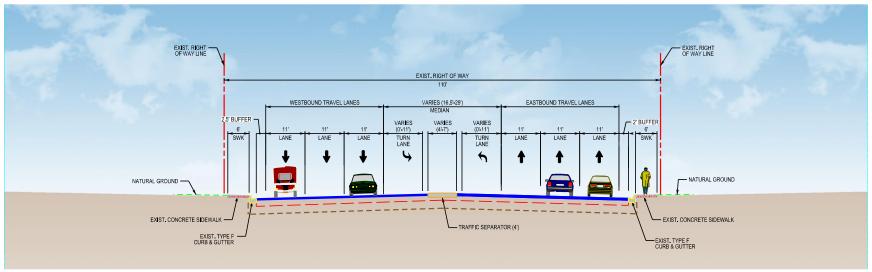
Typical Section - Lantana Road west of High Ridge Road
